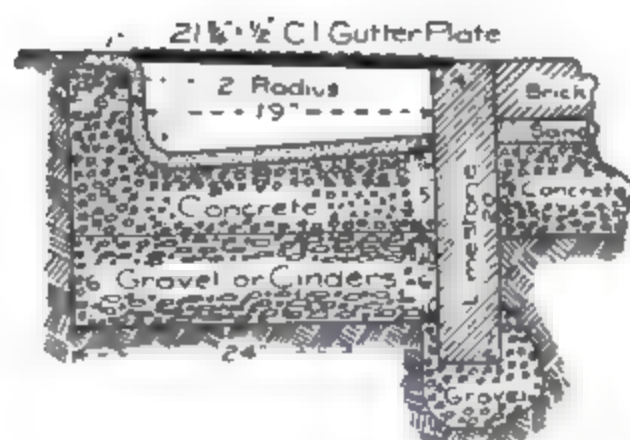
GUTTER FOR ELEVATED BRICK CROSSING WITH LIMESTONE FALSE CURB.
